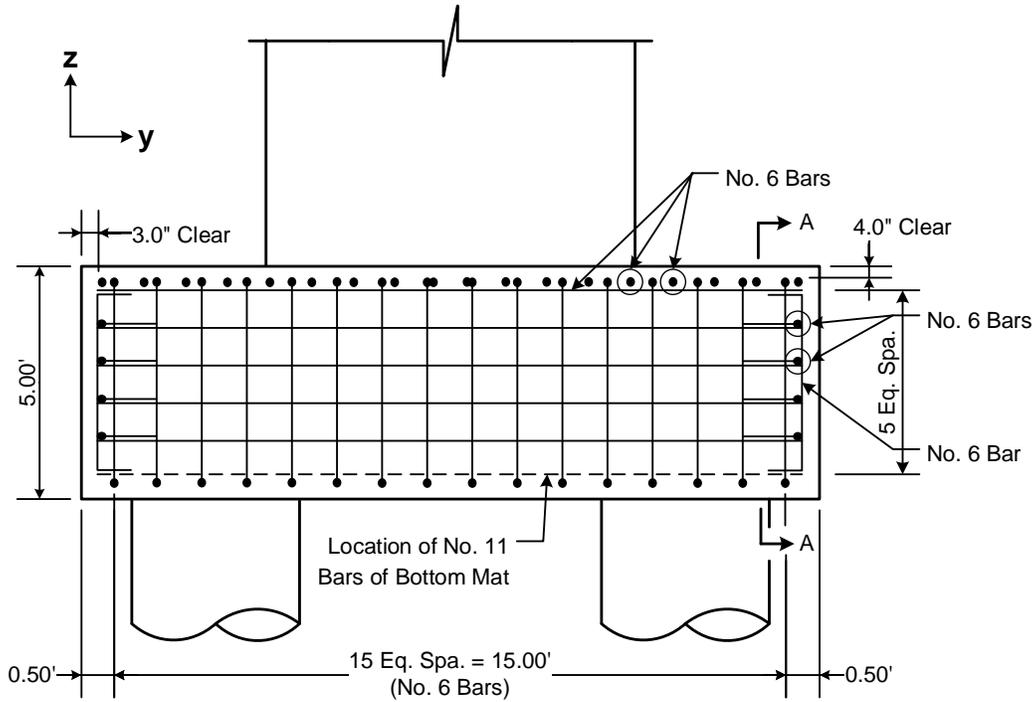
Reinforcement Details 3 - Temperature and Shrinkage Reinforcement
